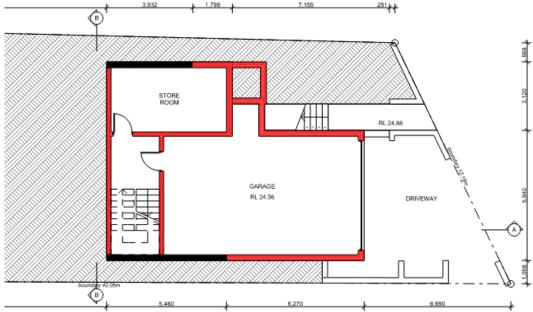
Ground level part new part exsiting (amended window location and dimensions)
